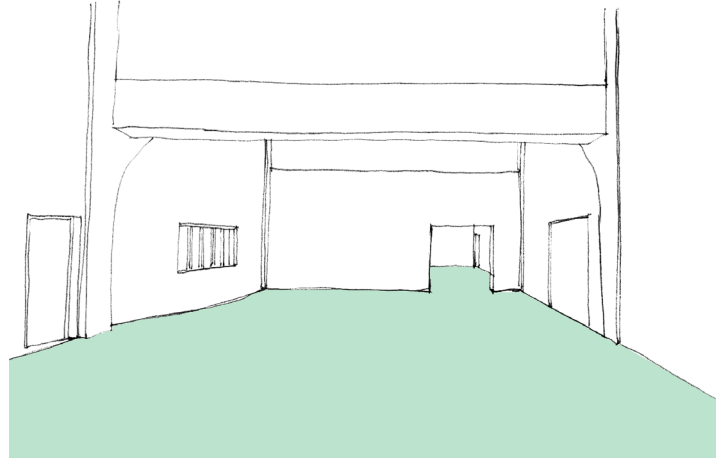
Room2: Mechanical room, 30 x 8m, 240m²
